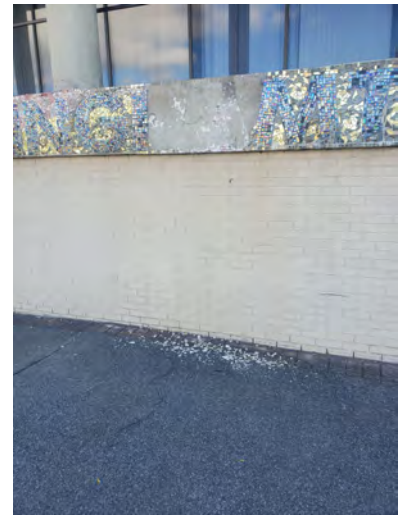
Crumbling Mural on the Riverwalk near Court Street
